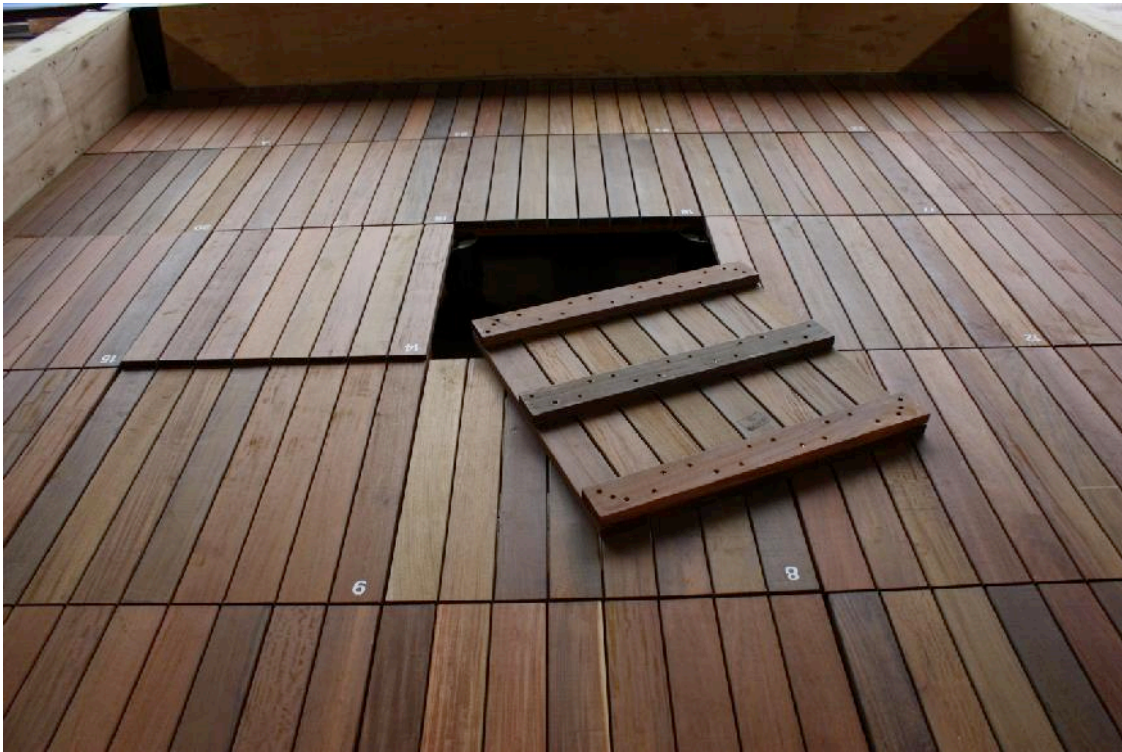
Blown off wood paver at the parallel slats, 0 degree, 12-in parapet configuration
